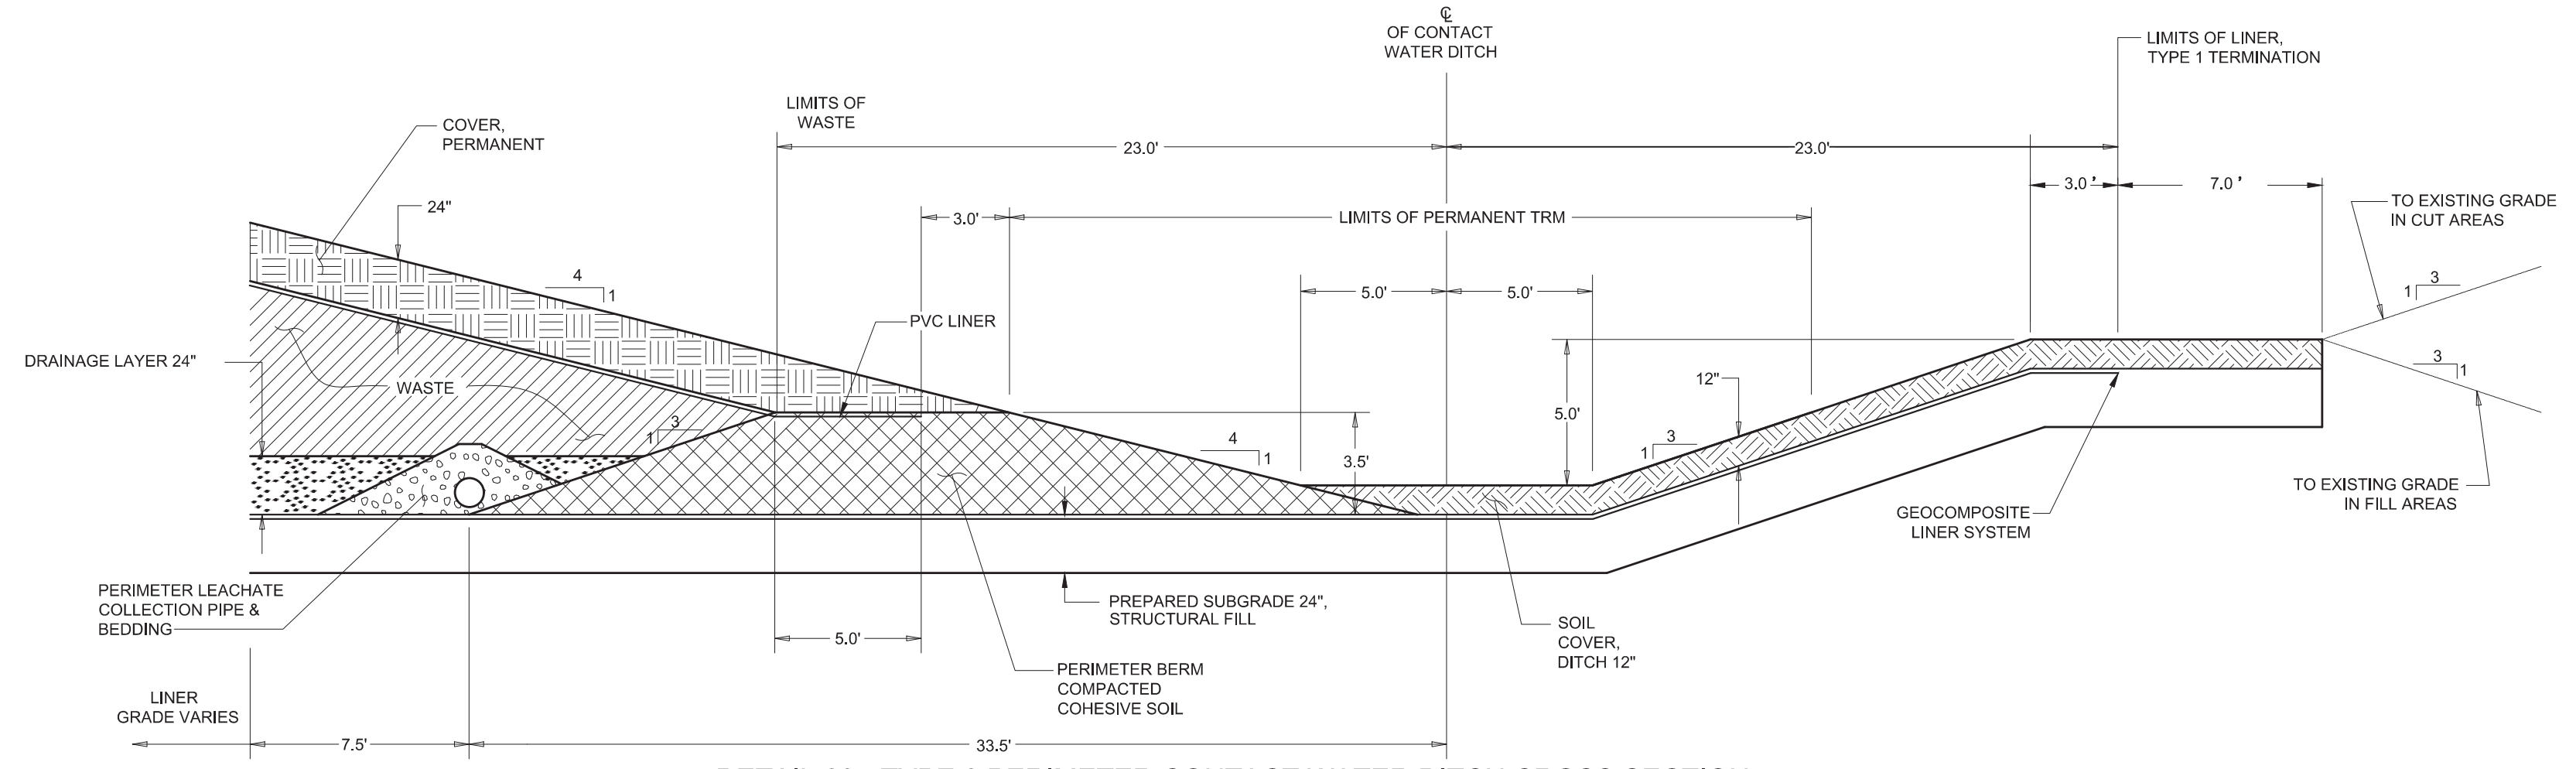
TYPE 1 PERIMETER CONTACT WATER DITCH CROSS SECTION
